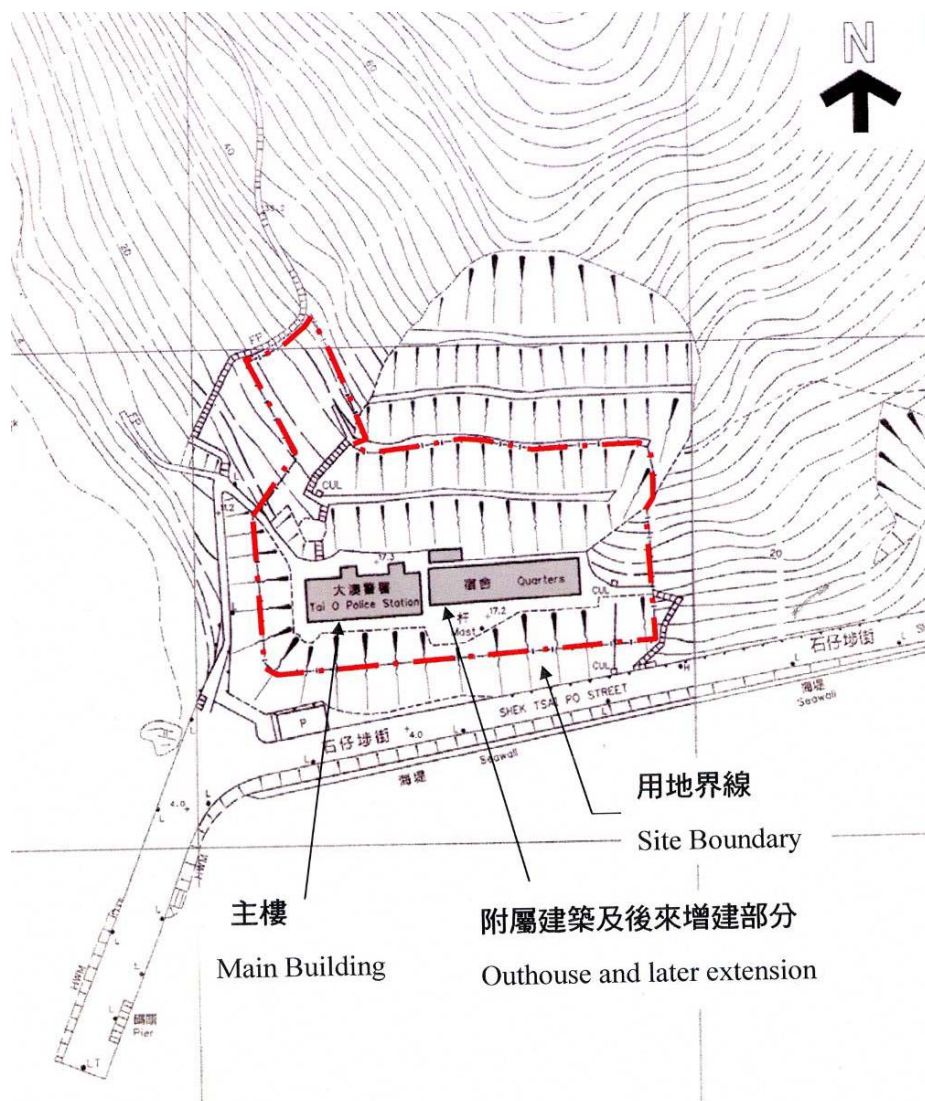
Site Boundary Plan of Old Tai O Police Station³
